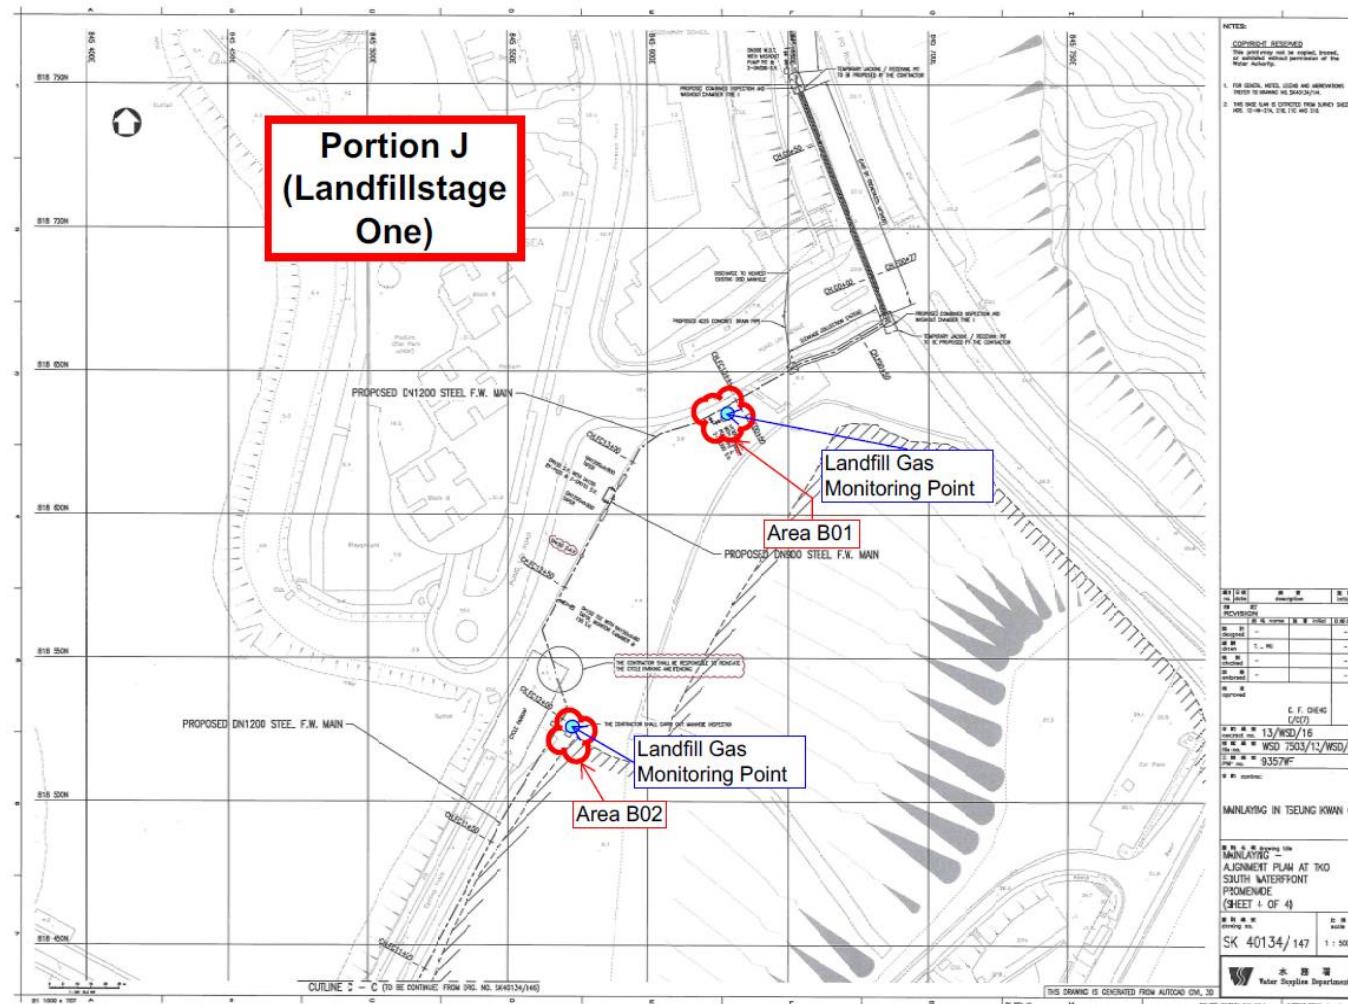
Location Plan for Portion J – Landfill Stage 1 (Area B01-B02)
